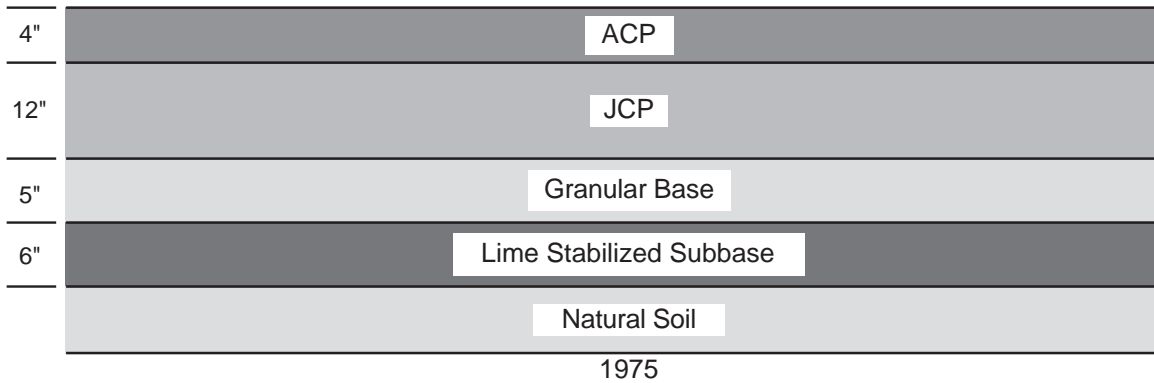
Cross-section of pavement section after being rehabilitated in 1975
